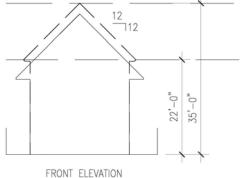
Permissible building envelope. Dormers comprising less than 10% of the footprint area may project above the height envelope.
